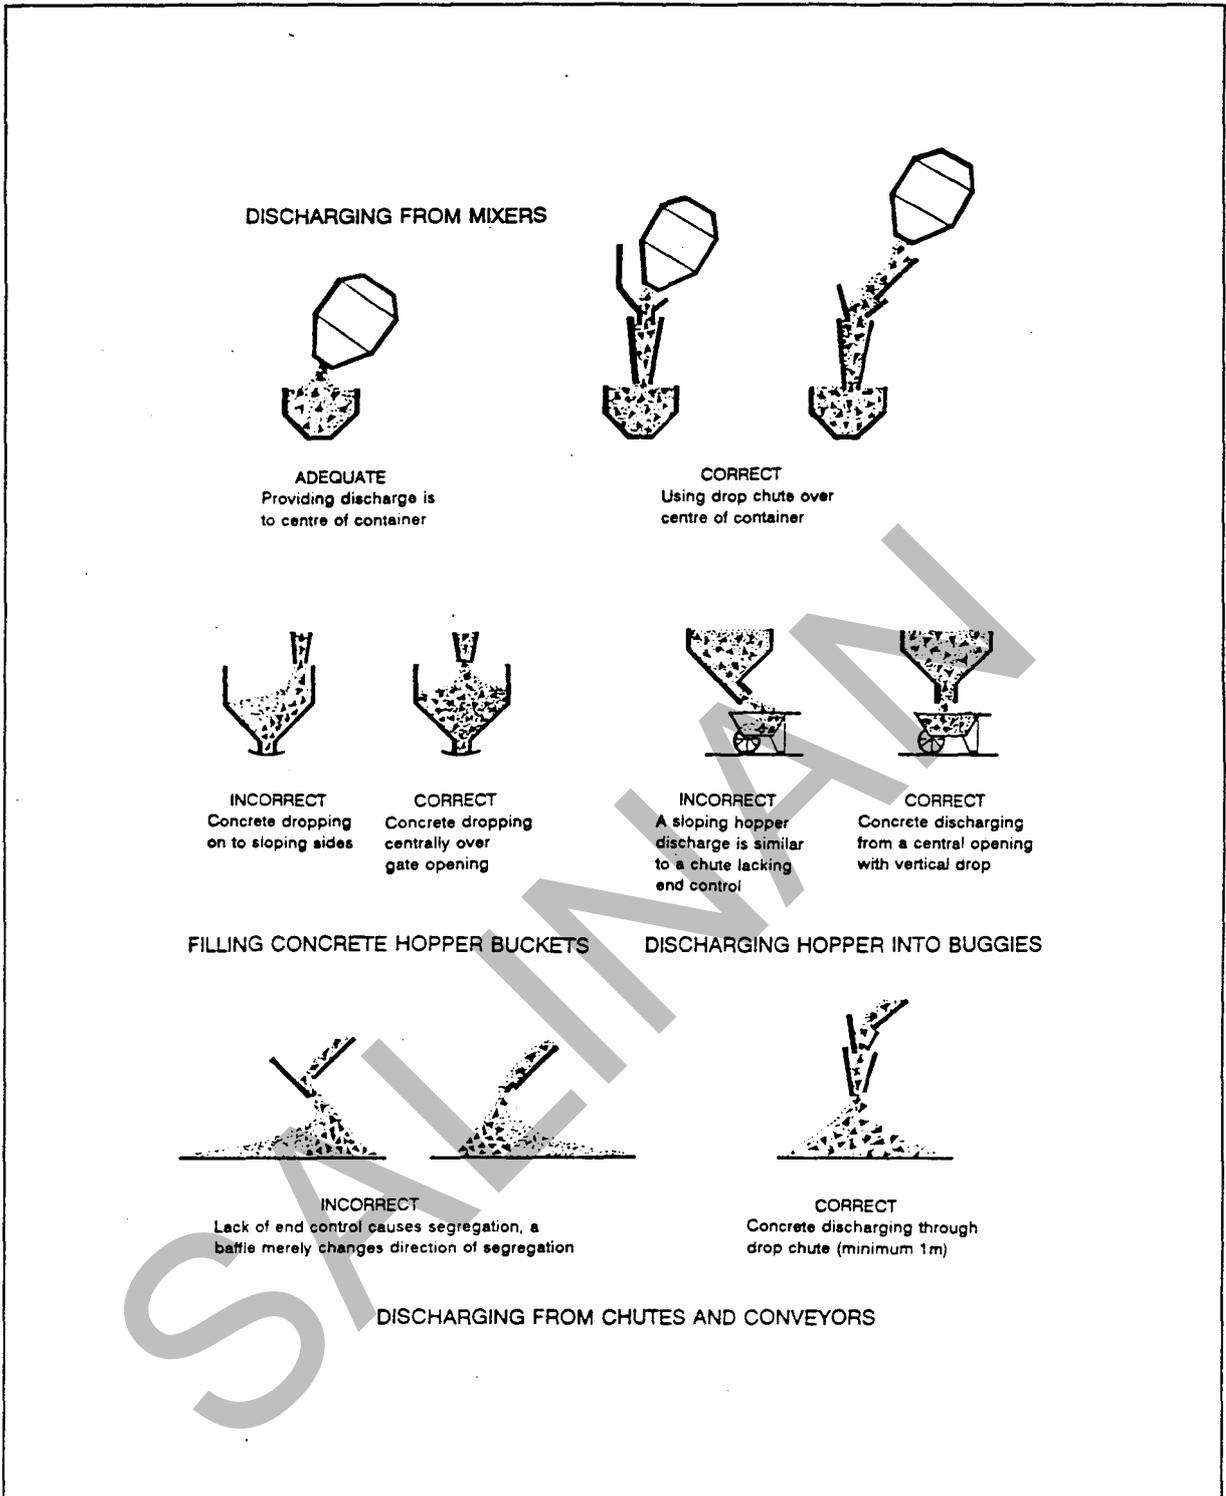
Handling and Transporting Concrete to Avoid Segregation
